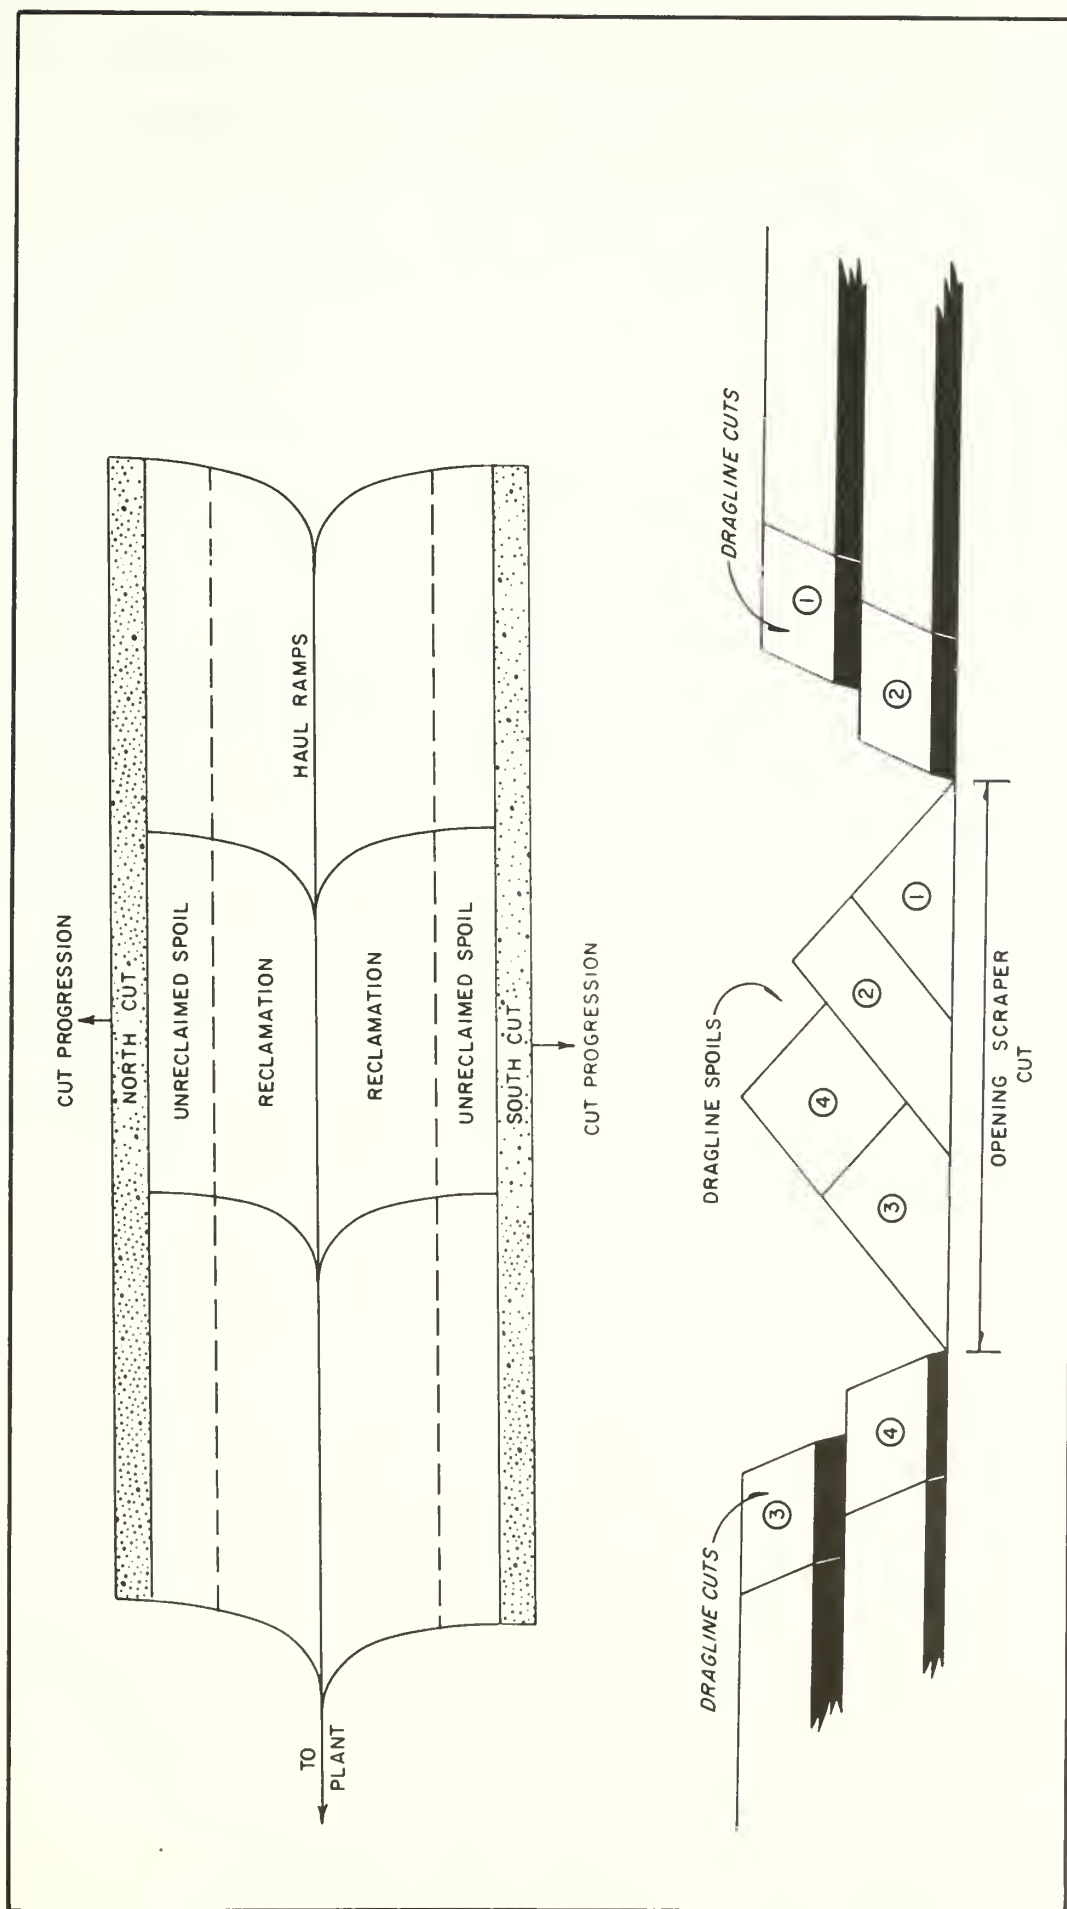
Schematic diagram showing method of overburden removal and placement of spoils under Alternate Mining Plan B-2 in the East Decker area.
